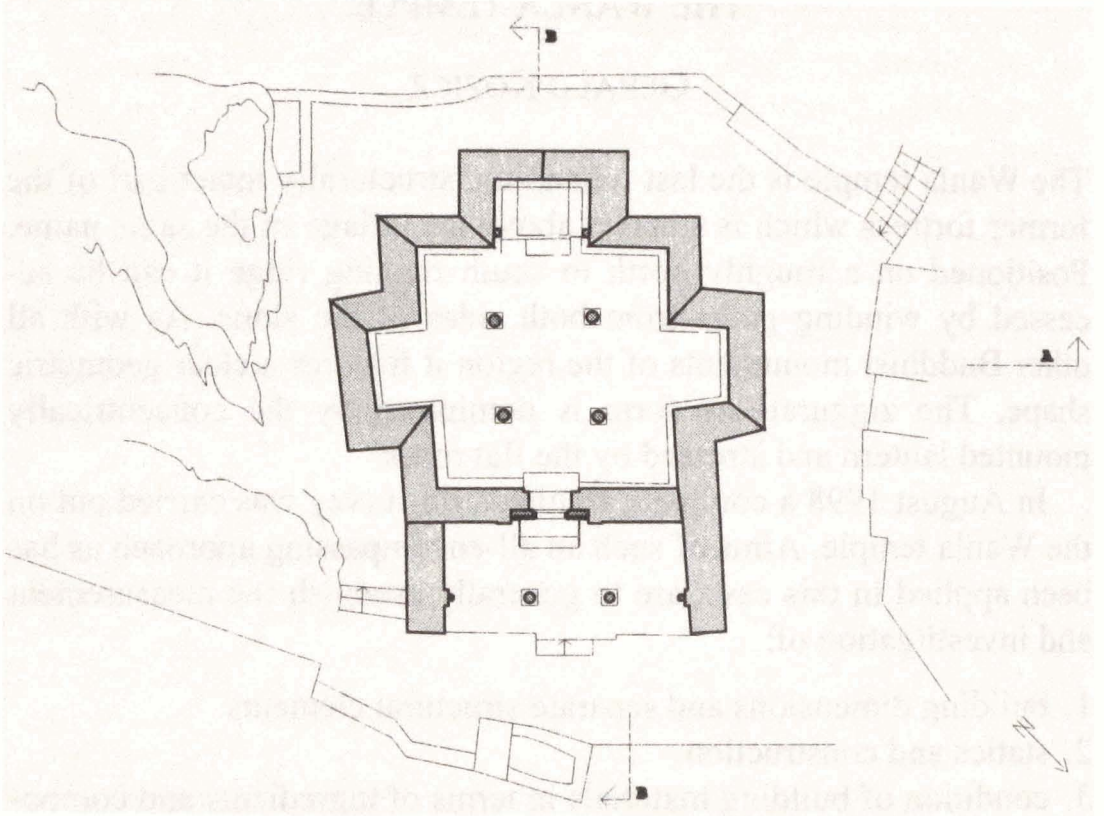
Ground-plan of the Wanla temple (drawing Gerald Kozicz)
